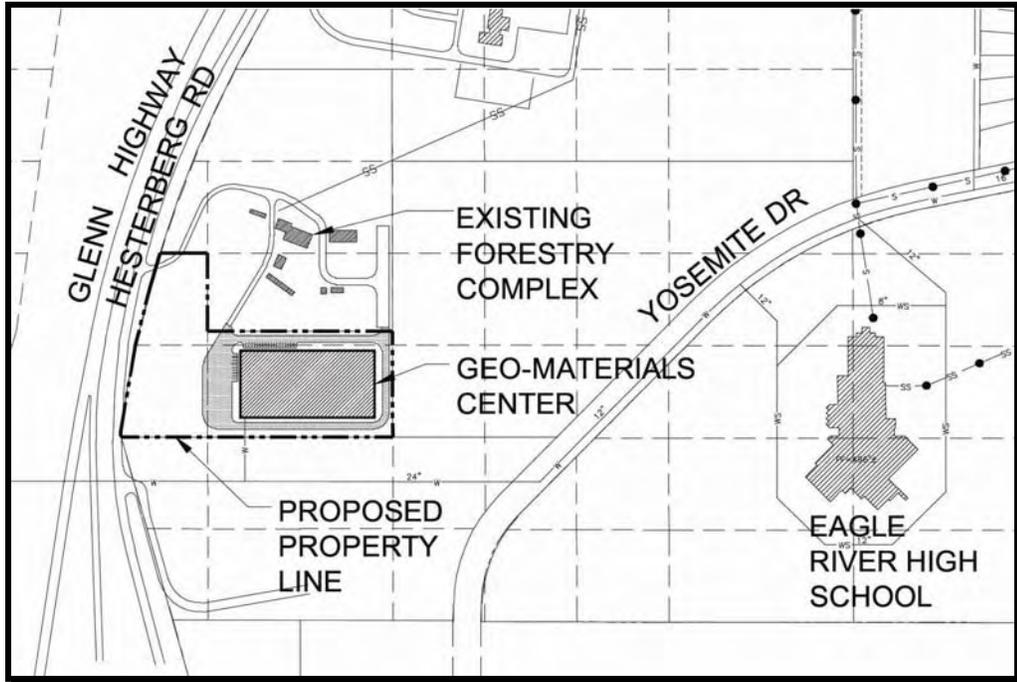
Site Plan (Option 1) Access from Existing Forestry Complex
